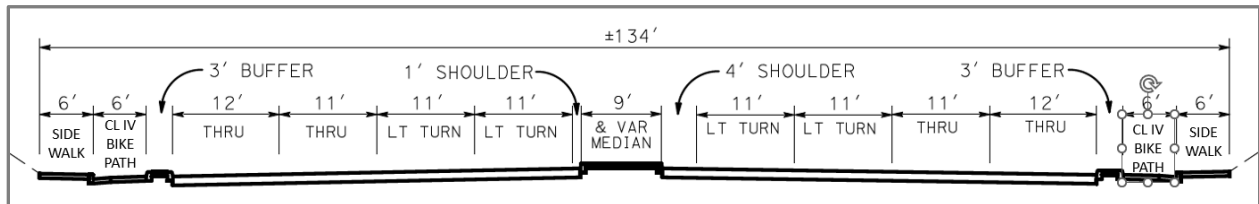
Alternative 3 – Middlefield Road Cross-Section
